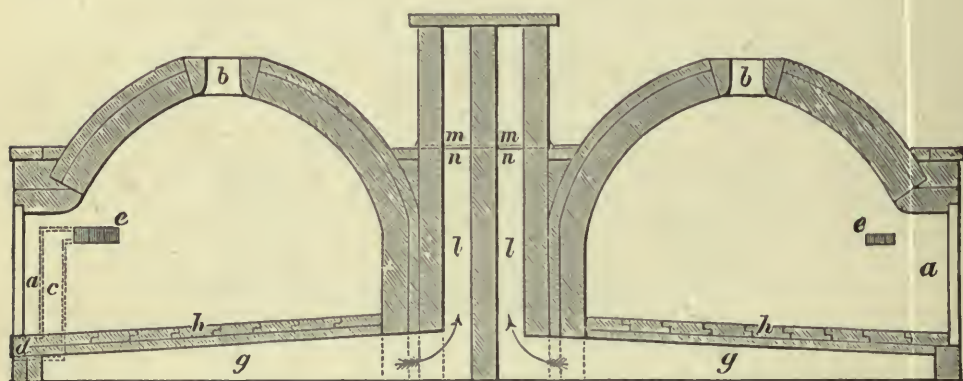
Breckon and Dixon's Coke Ovens (Sectional Elevation).
